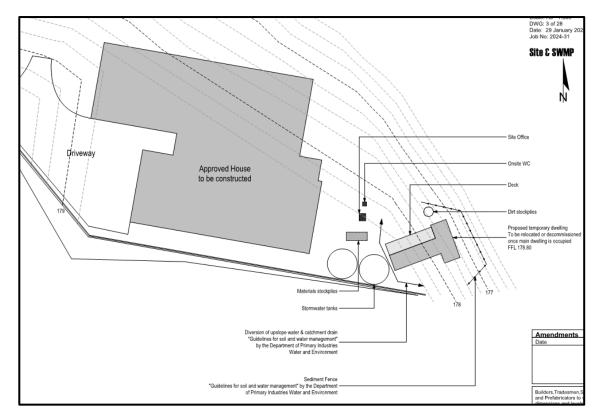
Site plan showing approved dwelling and proposed temporary dwelling.
